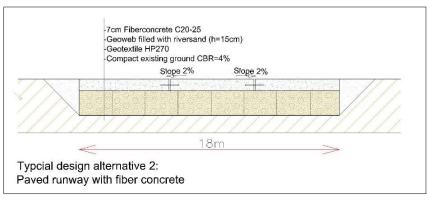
Typical design paved runway, Alternative 2. Source: Own elaboration
